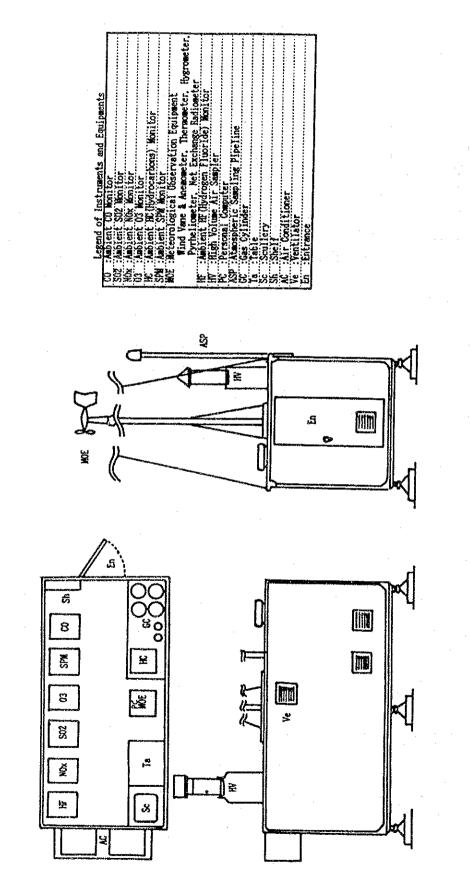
LAYOUT PLAN FOR INSPECTION STATION (ALTERNATIVE)
